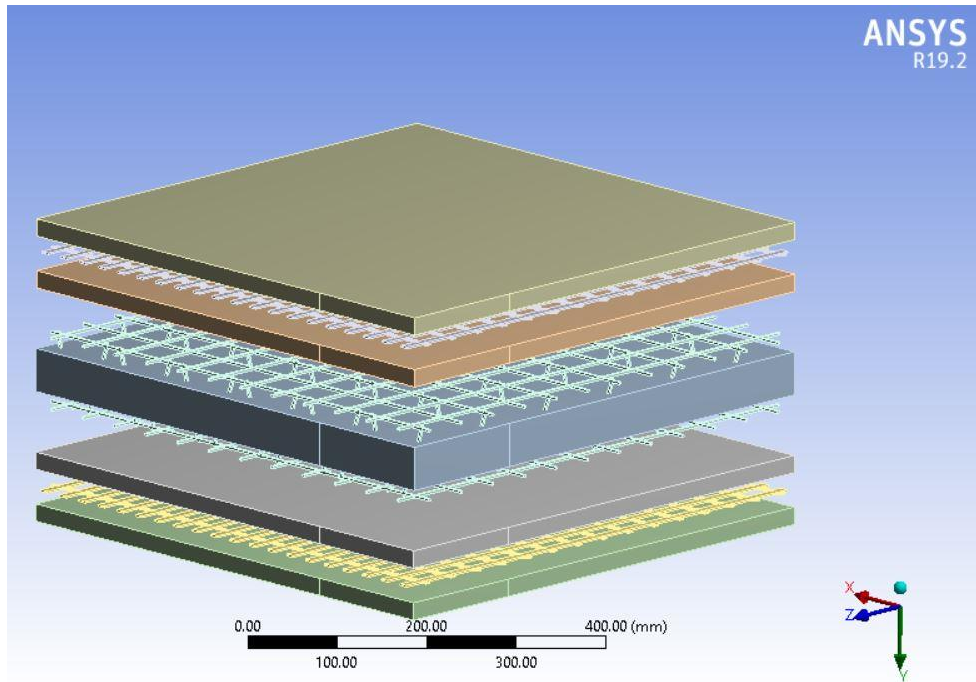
4: Diagonal shear specimen with PBG (Exploded view)
